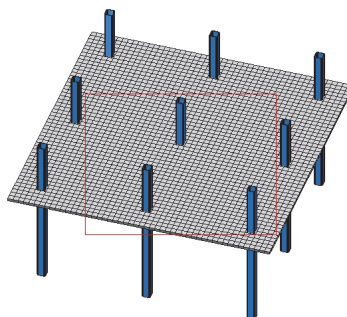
Calculated model of reinforced concrete slab reinforced with external prestressed reinforcement
